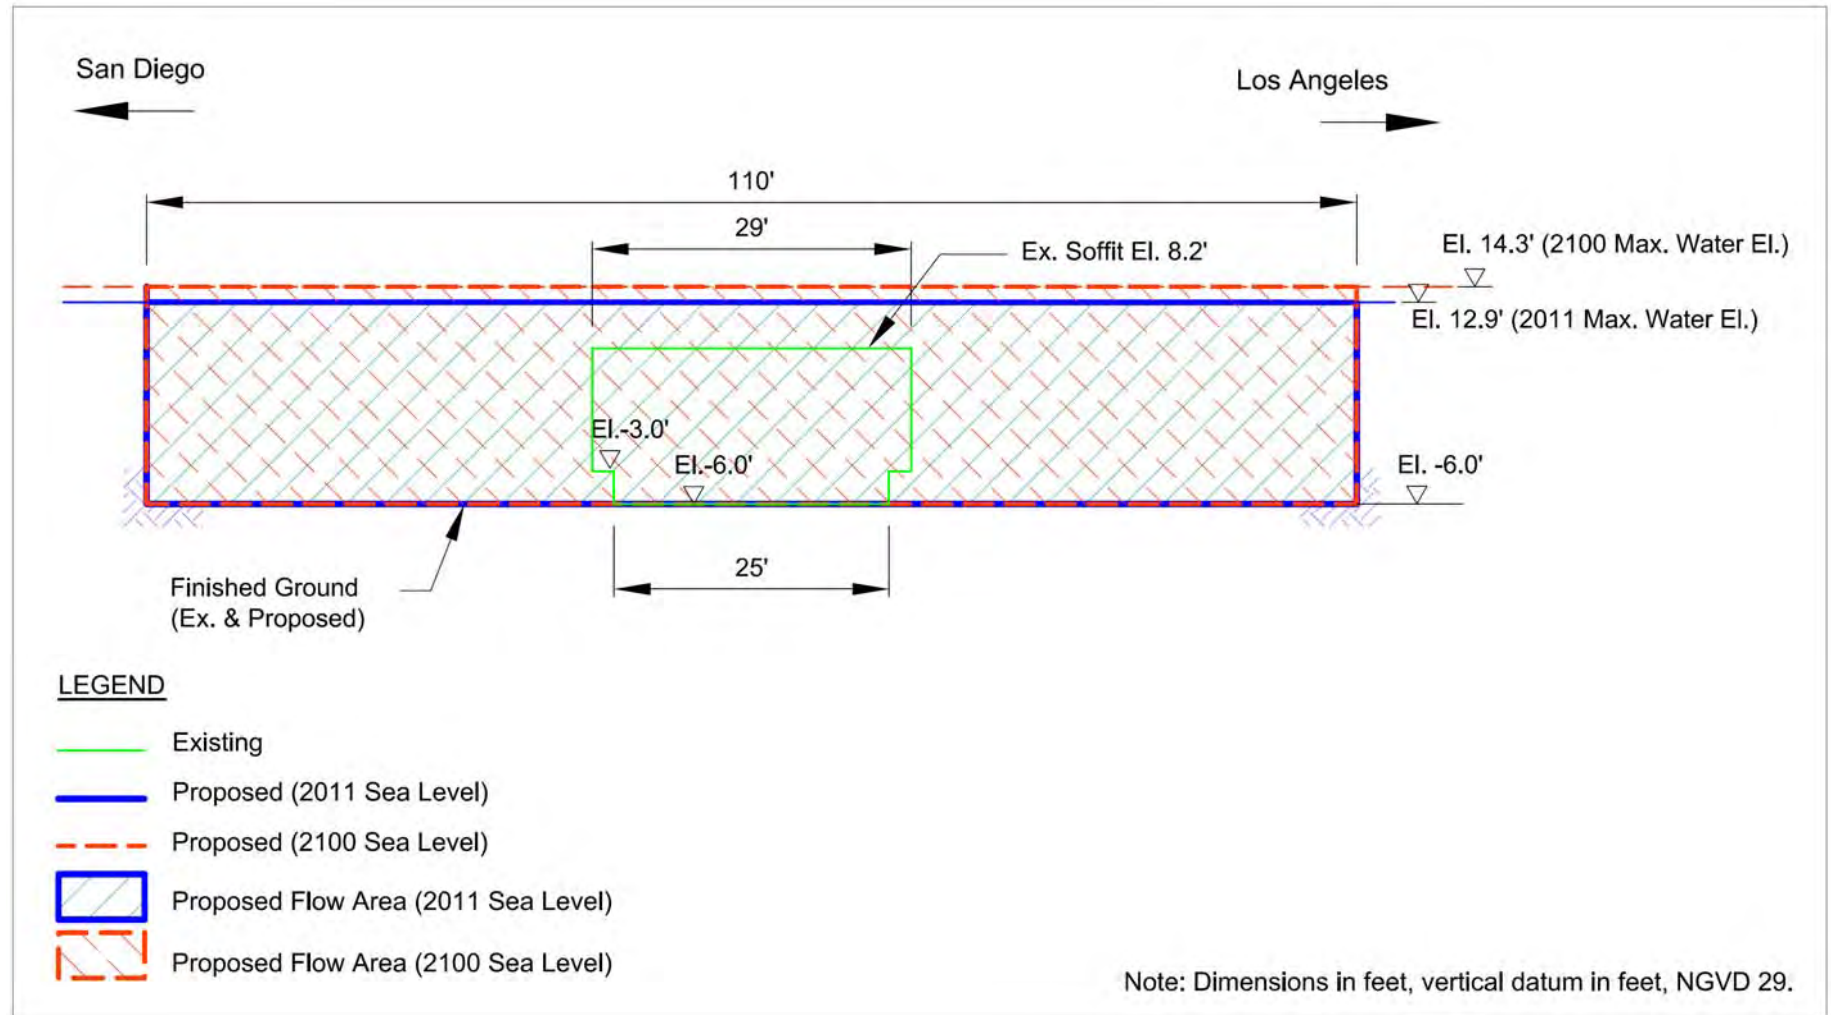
Desired Channel Cross Section of Coast Highway Bridge at Buena Vista Lagoon
